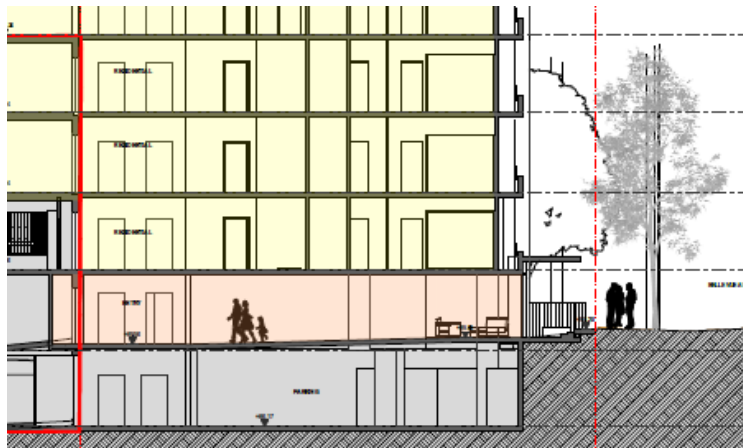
Proposed 2.5m Ceiling Height at Lobby Entrance (in Pink)
